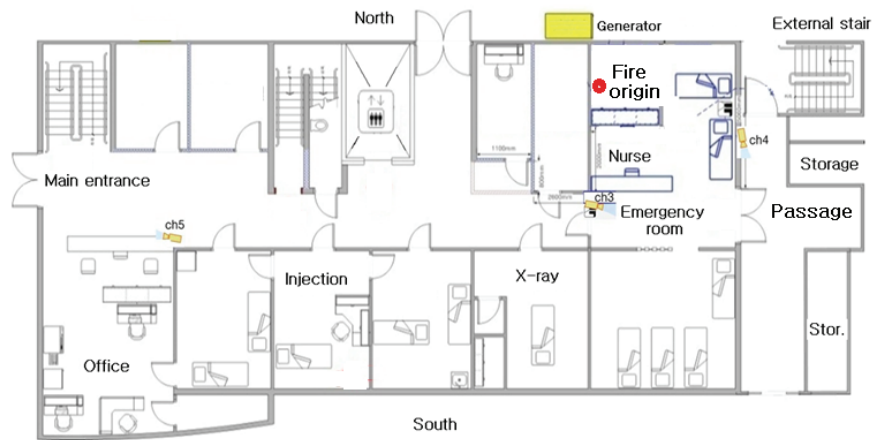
The 1st Floor Plan in Sejong Hospital Fire
